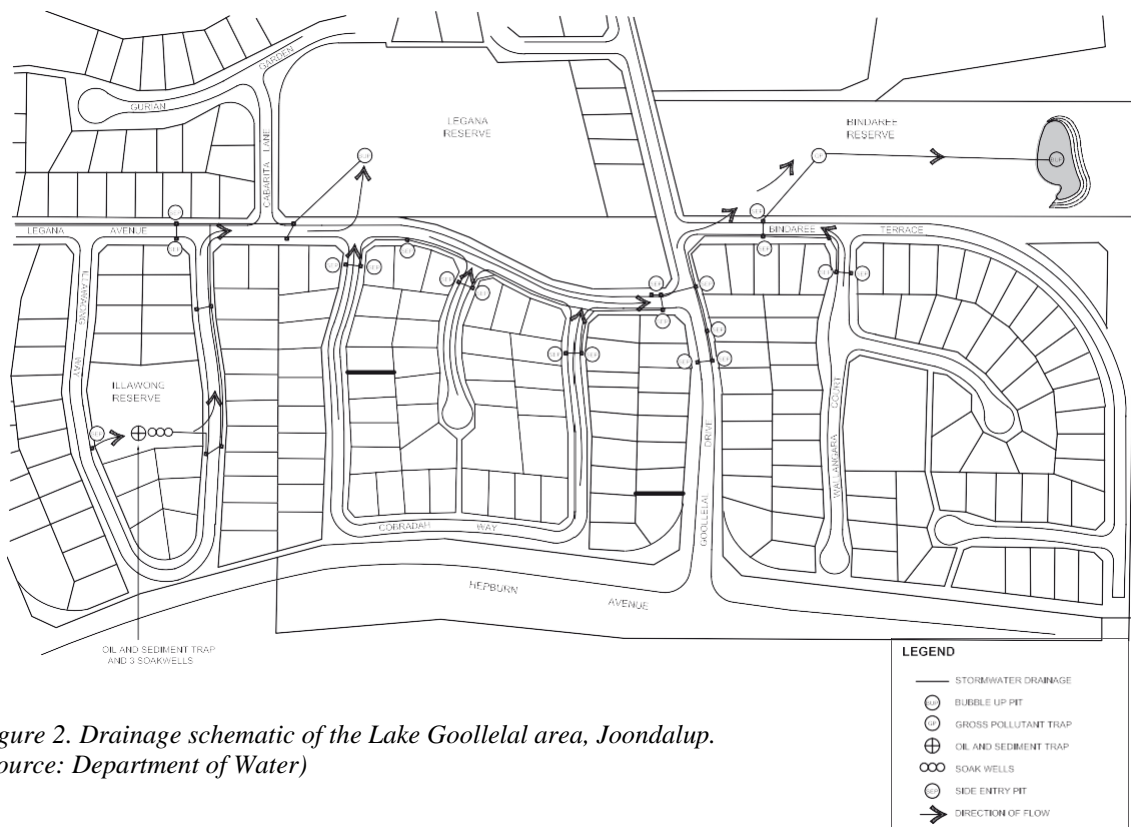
Drainage schematic of the Lake Goollelal area, Joondalup. (Source: Department of Water)
